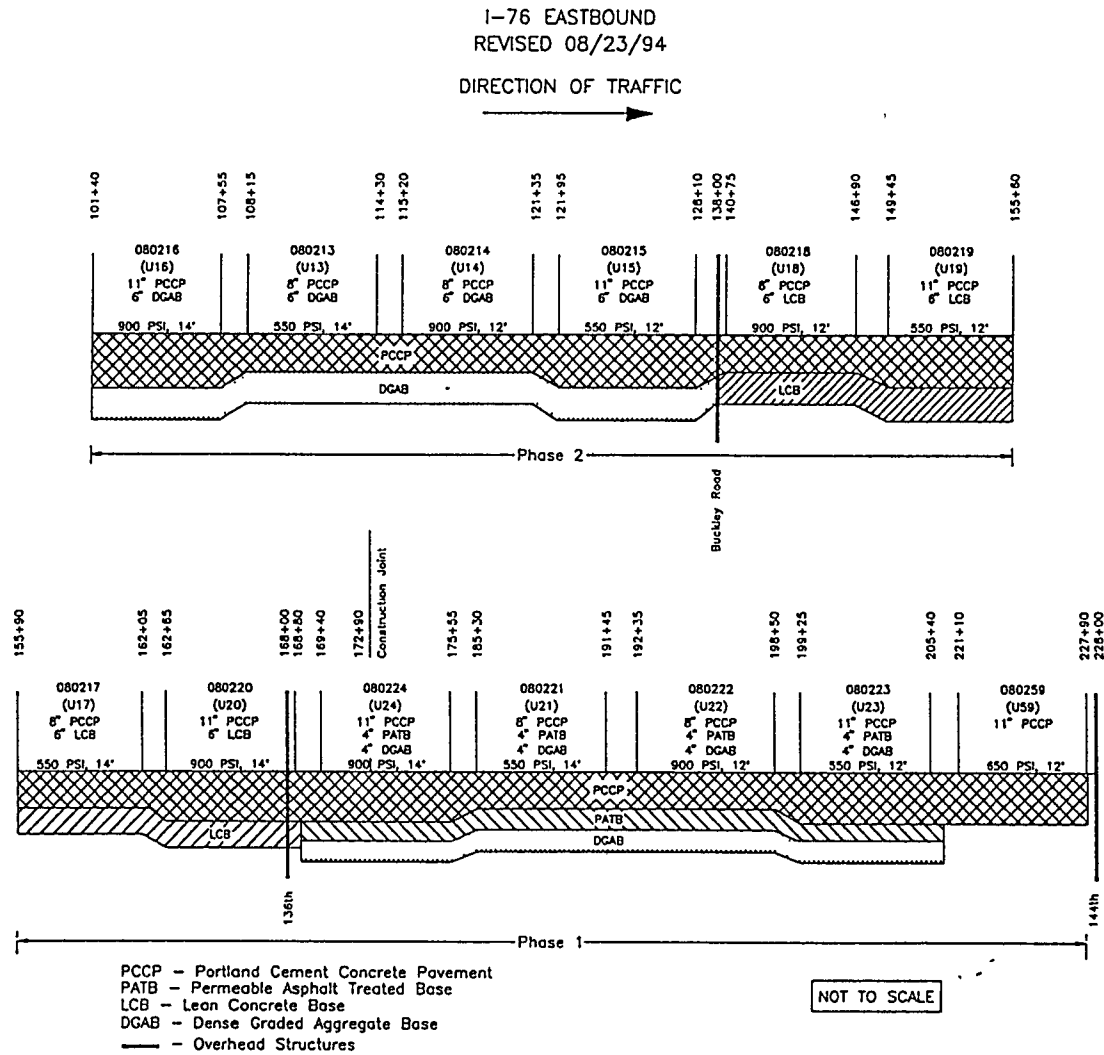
Layout and construction sequence of experimental test sections, Colorado SPS-2 project.
